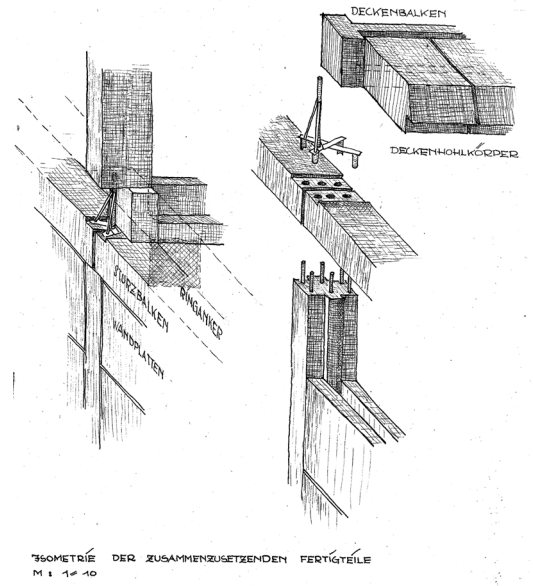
Ernst Agonat, Housing block, 1949. Construction details (Eduardo Torroja's archive).
